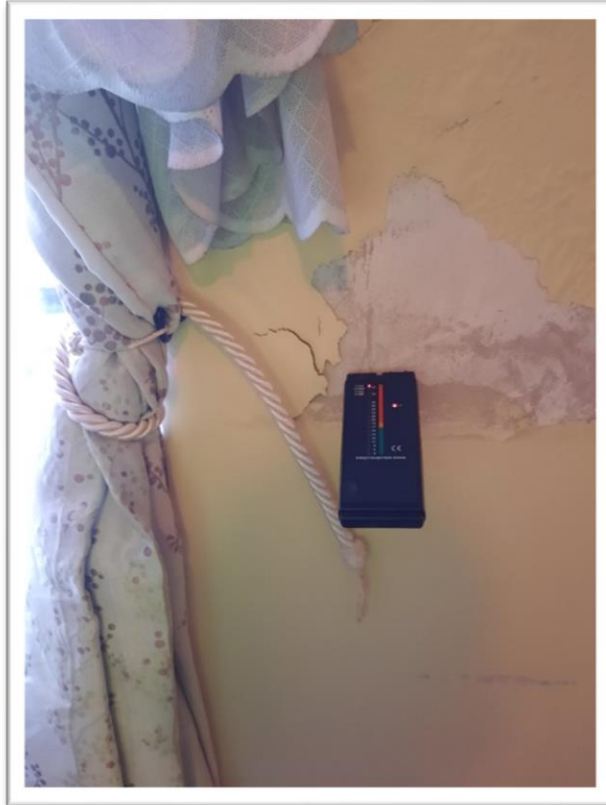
Blistered and damaged plasterboard internal lining at front wall 1st floor LHS
